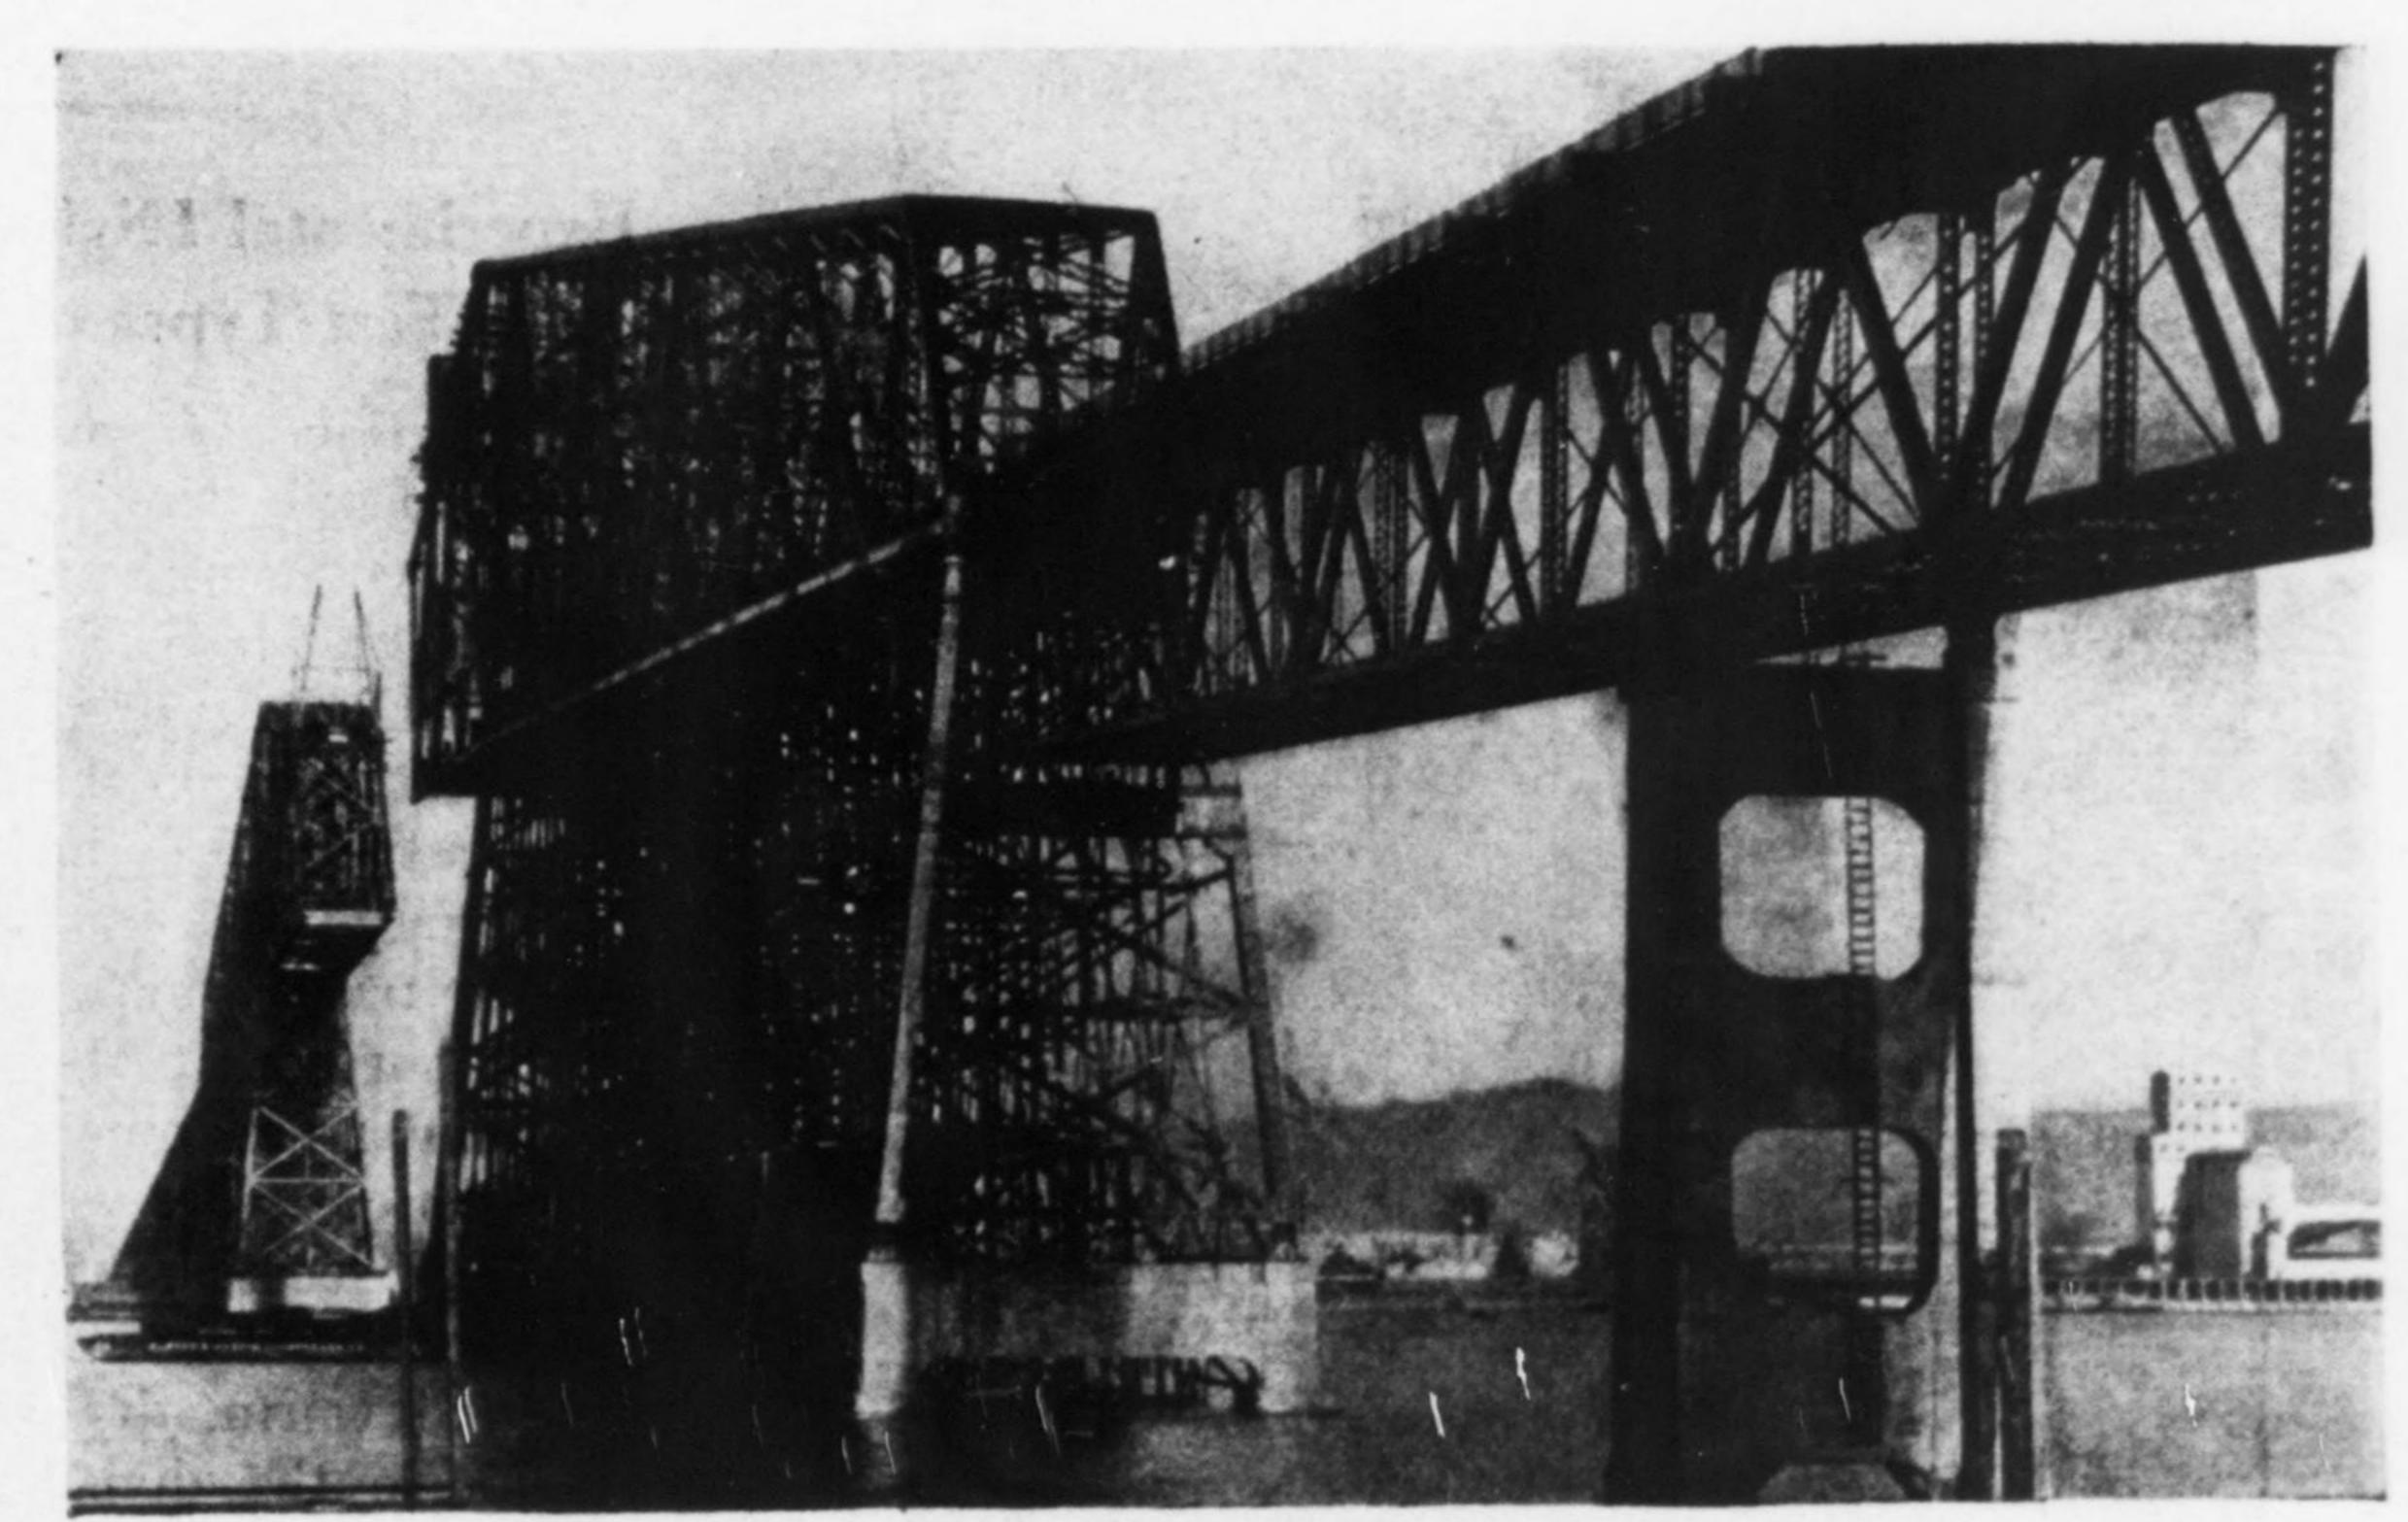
LONGVIEW BRIDGE PROVIDES 195-FT. VERTICAL CLEARANCE UNDER MAIN SPAN Note the timber falsework supporting anchor arms.
